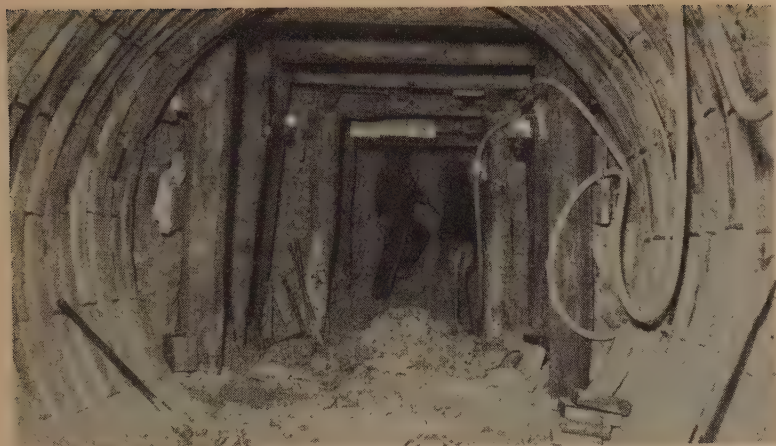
SHOWING METHOD OF ADVANCING GALLERY HEADING BEFORE PLACING BLOCK-LINING GROUND SUPPORTS.
